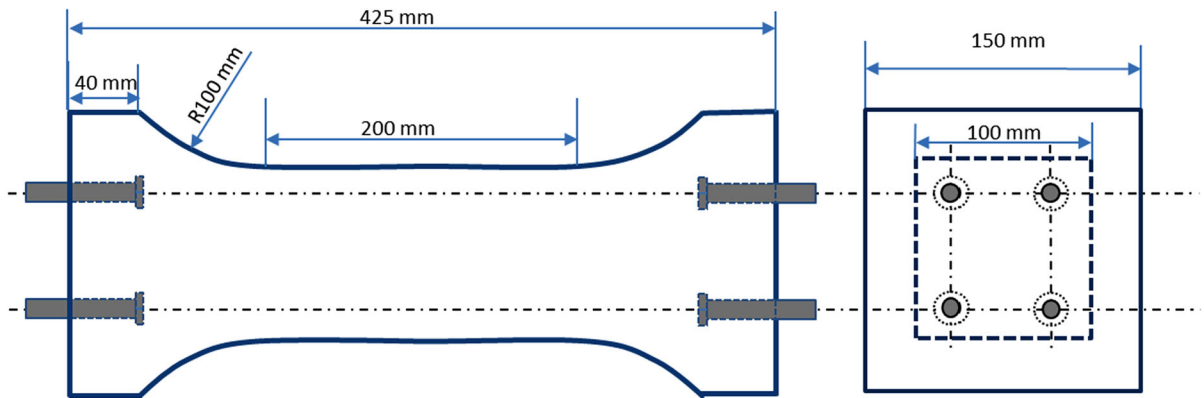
Shape and dimensions of dumbbell specimen for tests under tension
